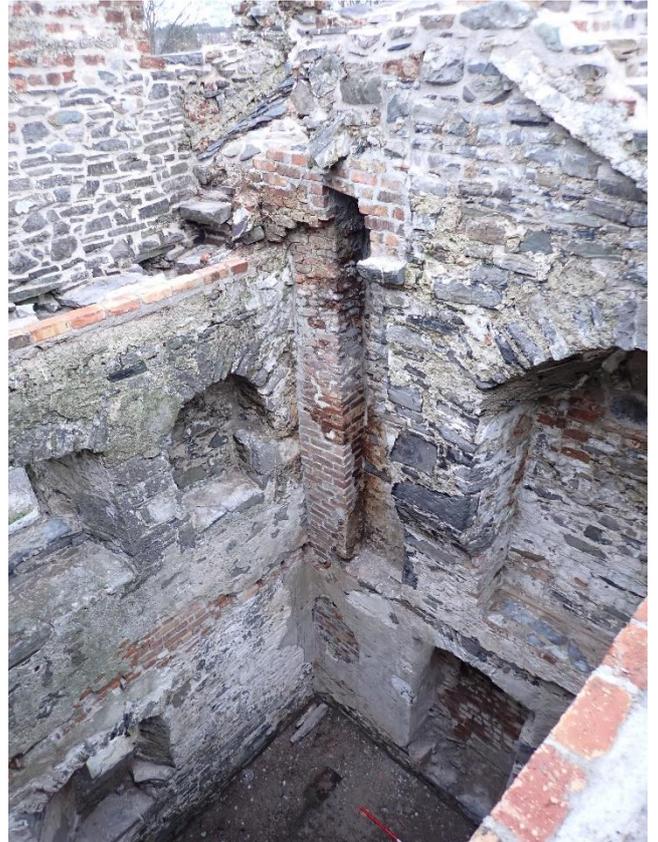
View looking down from the entrance to the wall walk at the NE corner.
